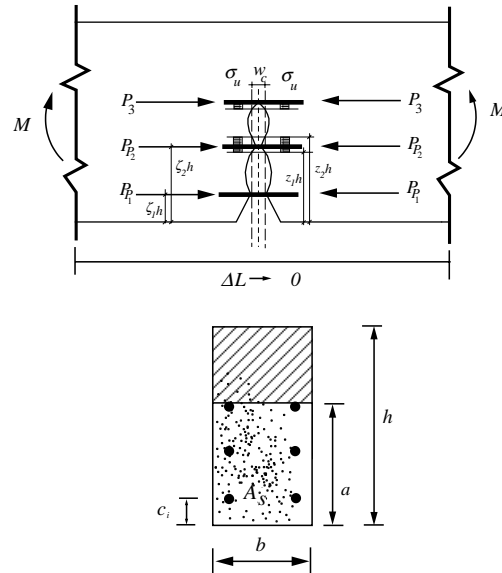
Scheme of a cracked reinforced concrete element containing fibers.
